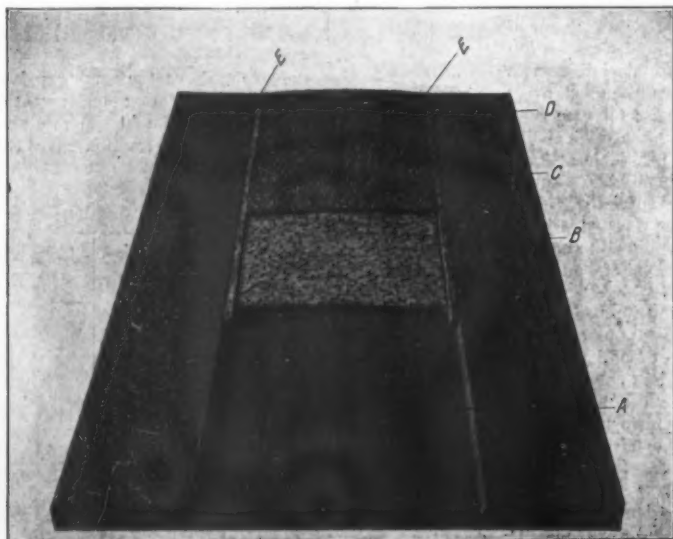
Model showing a French road of Trésaguet, built between 1775 and 1830.
